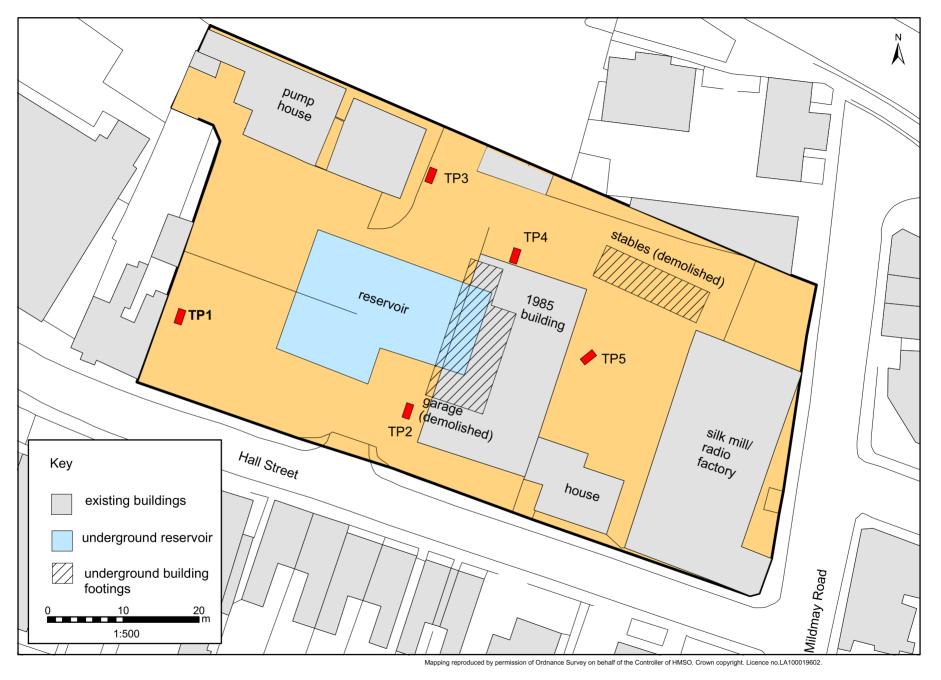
Site plan, showing existing buildings, known below-ground structures and location of proposed trial pits (1-5)
